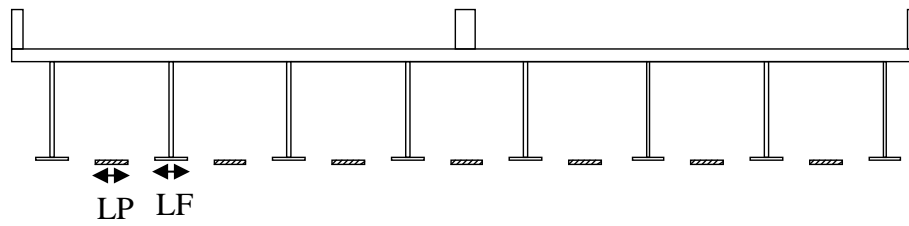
Illustration of horizontal plates installed between the bridge girders with LP = LF (Case H4)
